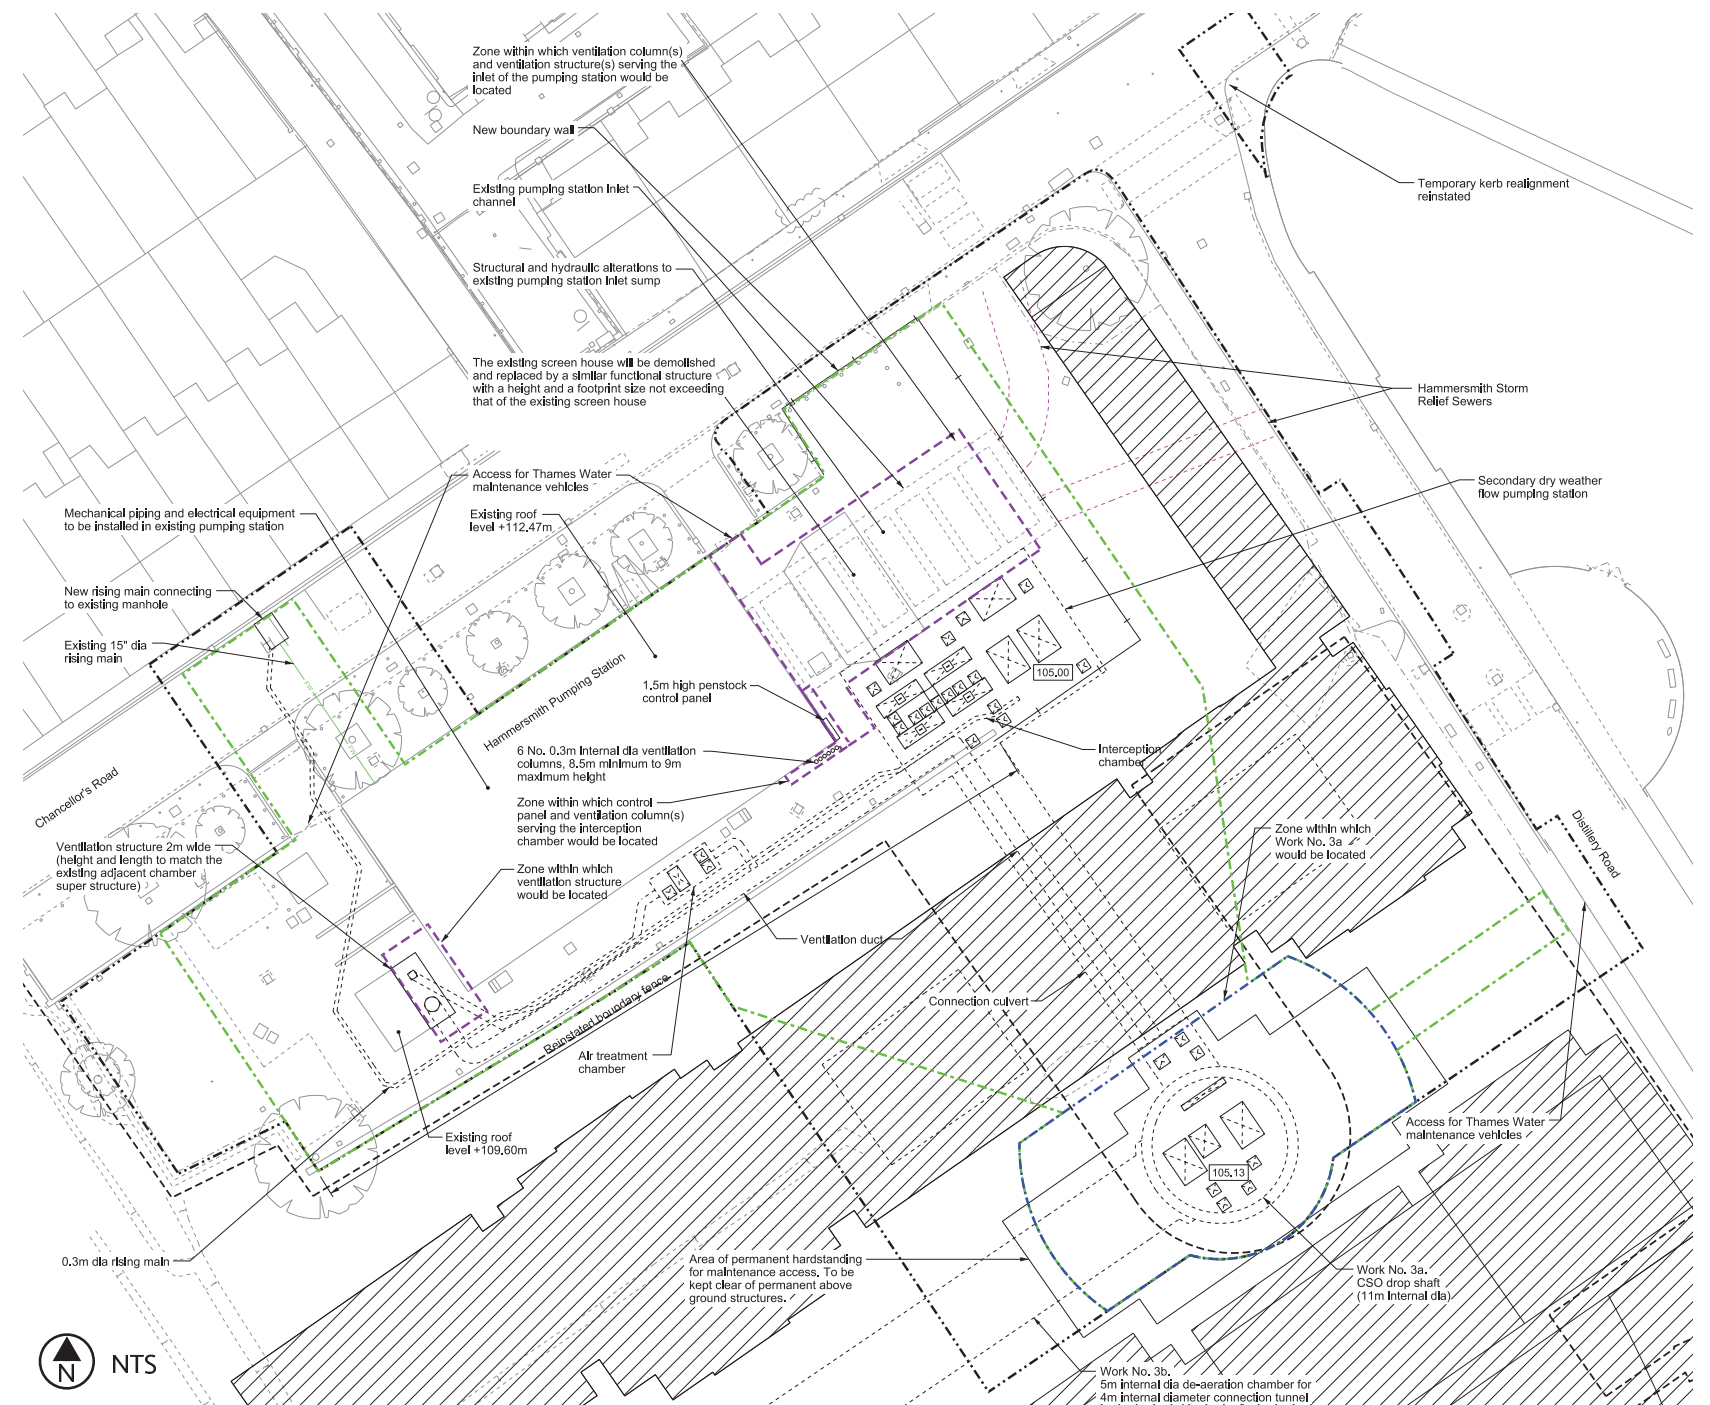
Permanent works layout - refer to Permanent works layout in the *Book of Plans
